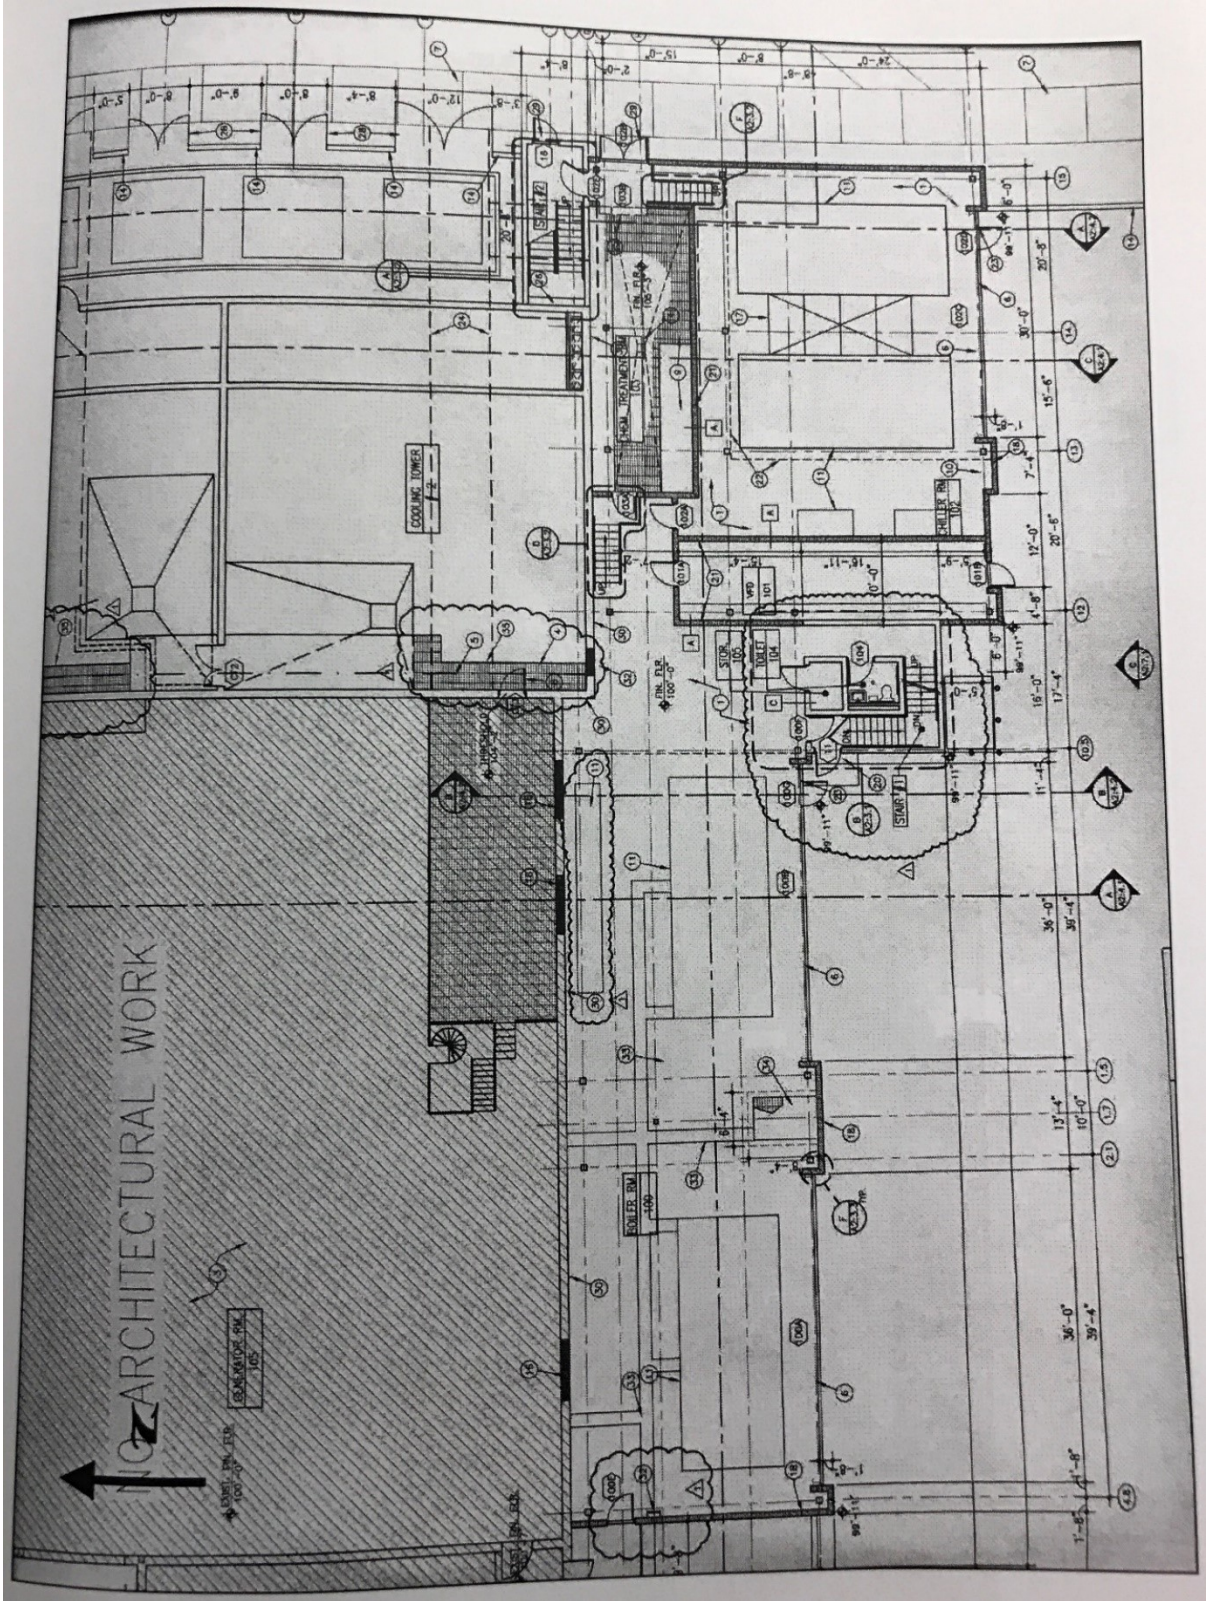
First floor plan of Ford Utility Center (Mareddy 2006).
